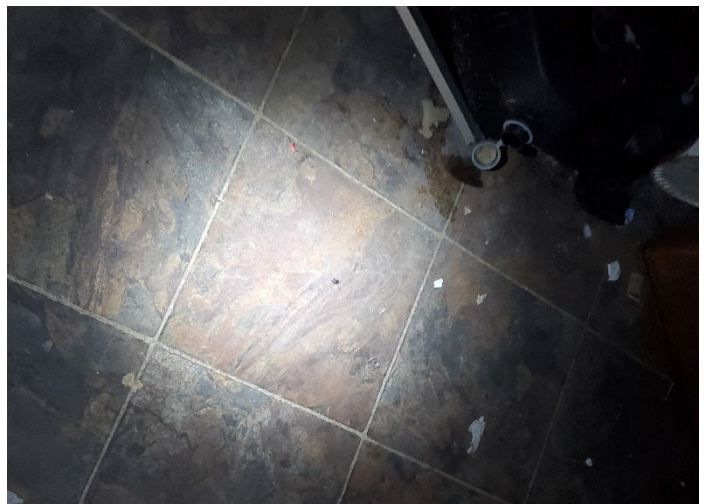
Brown/Gray marble roll vinyl located in hallway and hallway bathroom.
